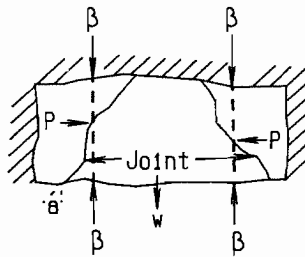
(a). Single Joint With Bolt Normal to Joint.
